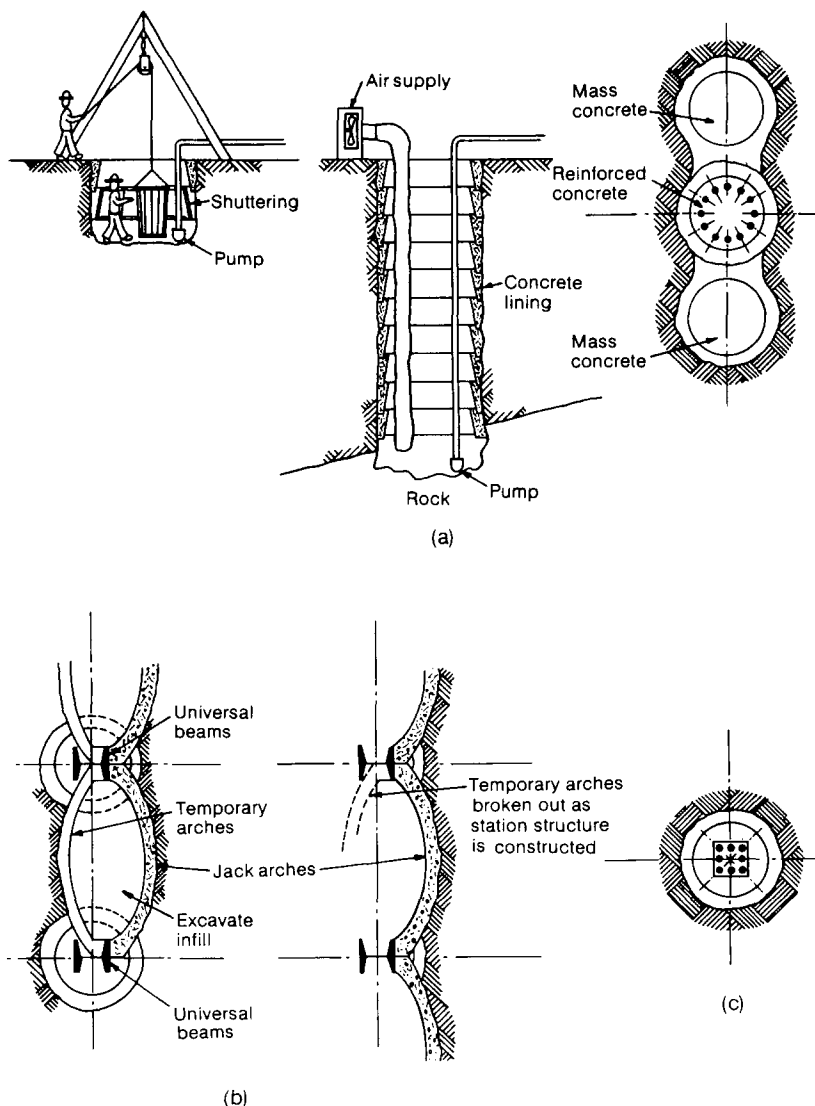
Hand-dug caissons: (a) wall construction, type 1; (b) wall construction, type 2; (c) construction for isolated reinforced concrete or structural steel columns
